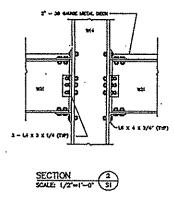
DETAIL OF SEATED CONNECTION FOR PROTOTYPE BUILDING
